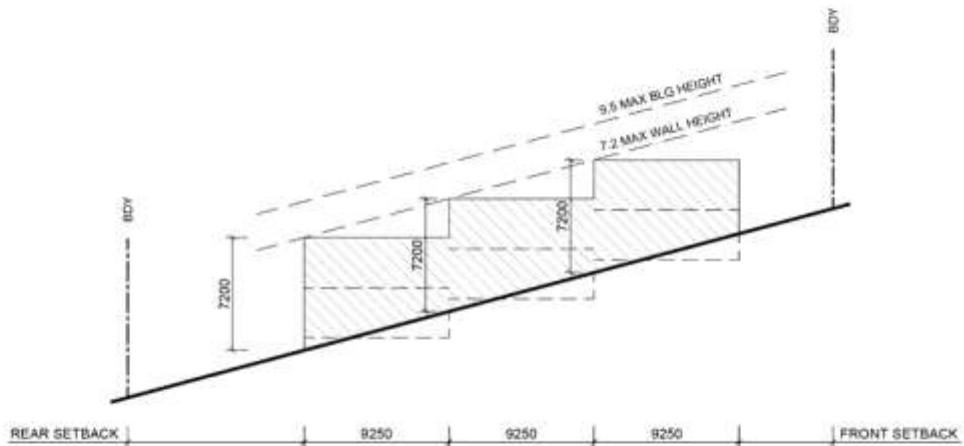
EXISTING MAXIMUM WALL HEIGHT CONTROL ON SITE WITH A 15 DEGREE SLOPE
